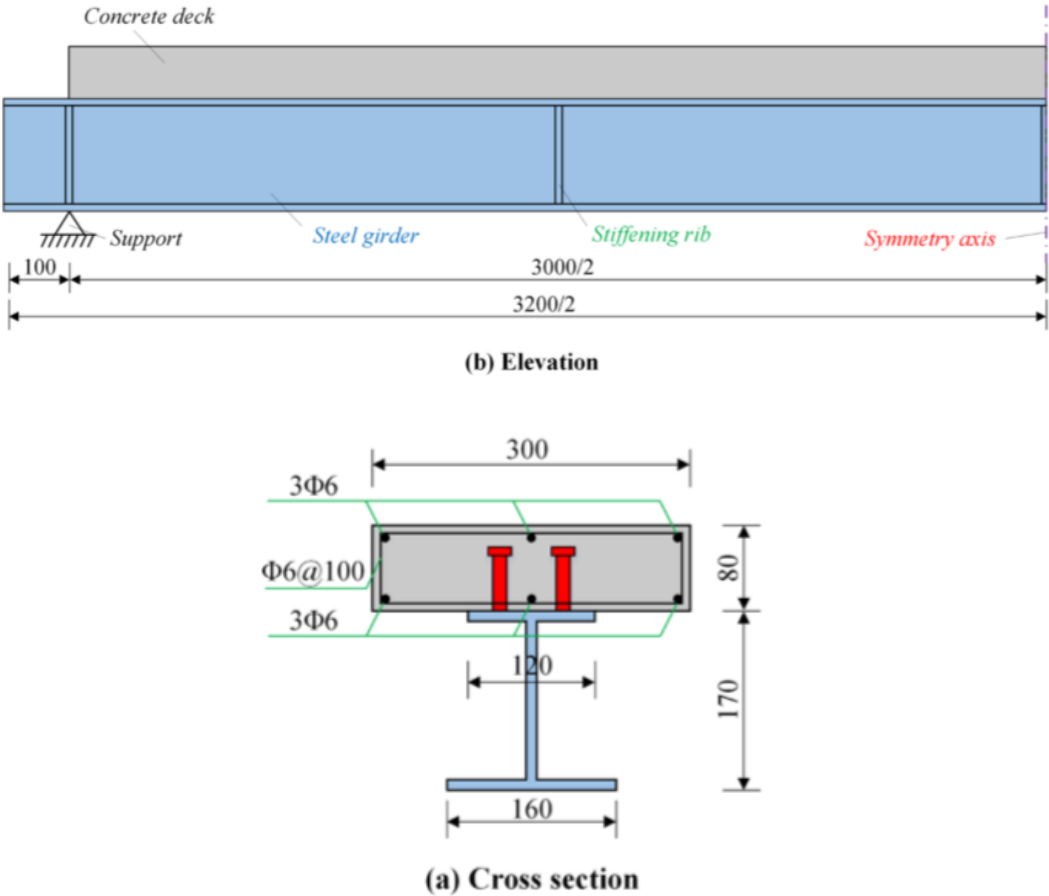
Dimension and reinforcement of specimen (unit = mm) [68].
